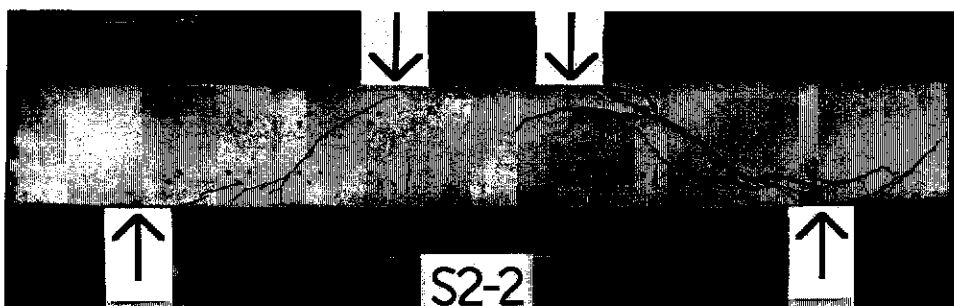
Crack Pattern of the Back Face of Beam S2-2
